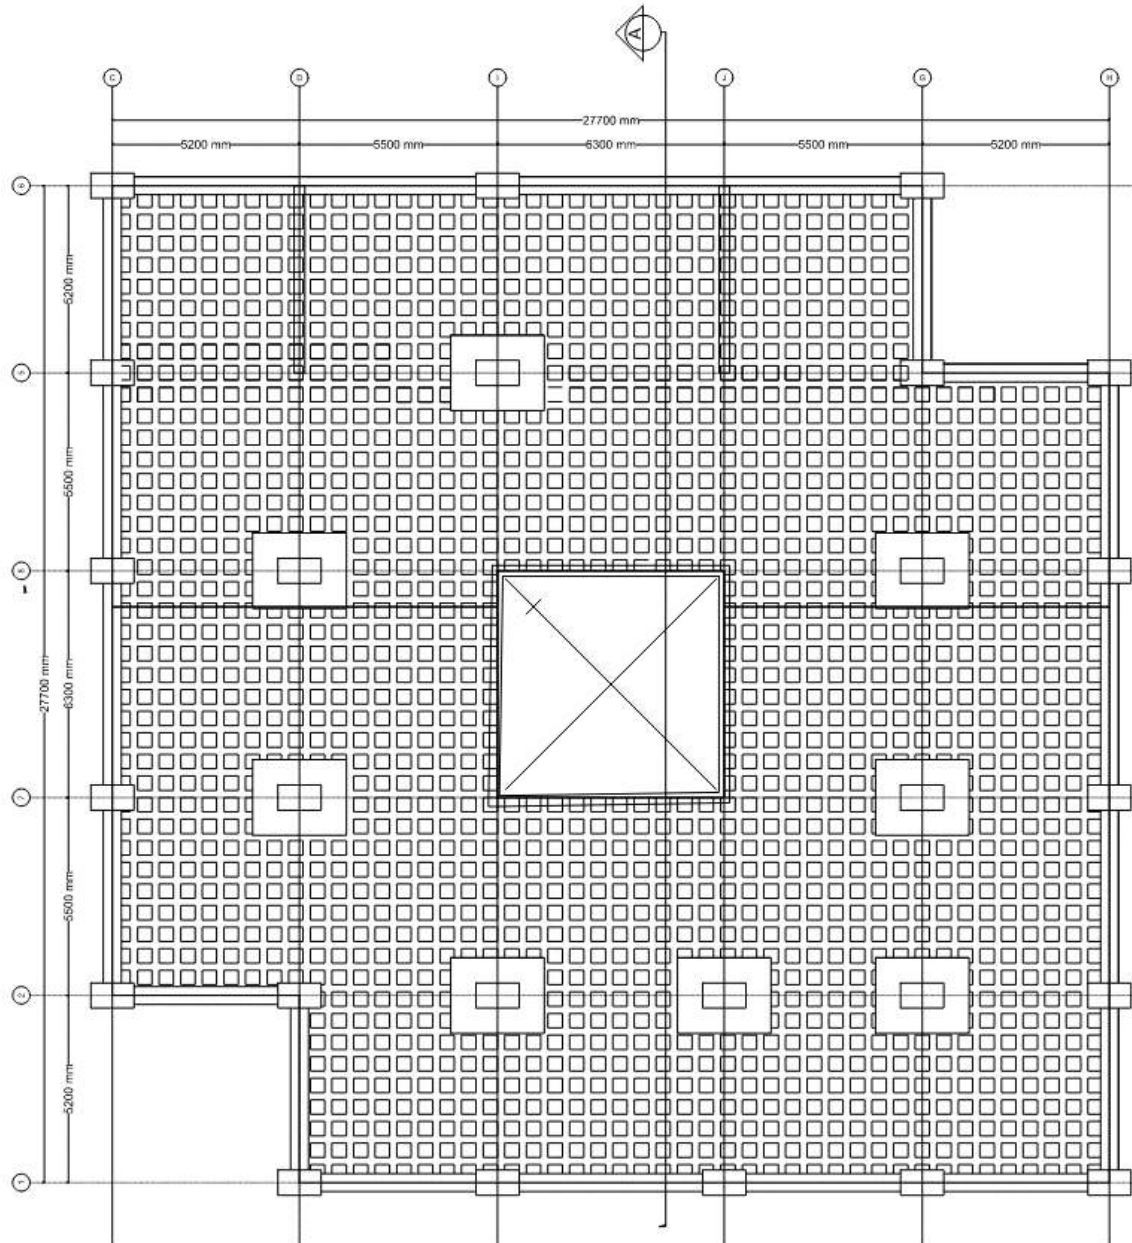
Show Framework Plan for Waffle Floor Model (6.3-5.5-5.2).
